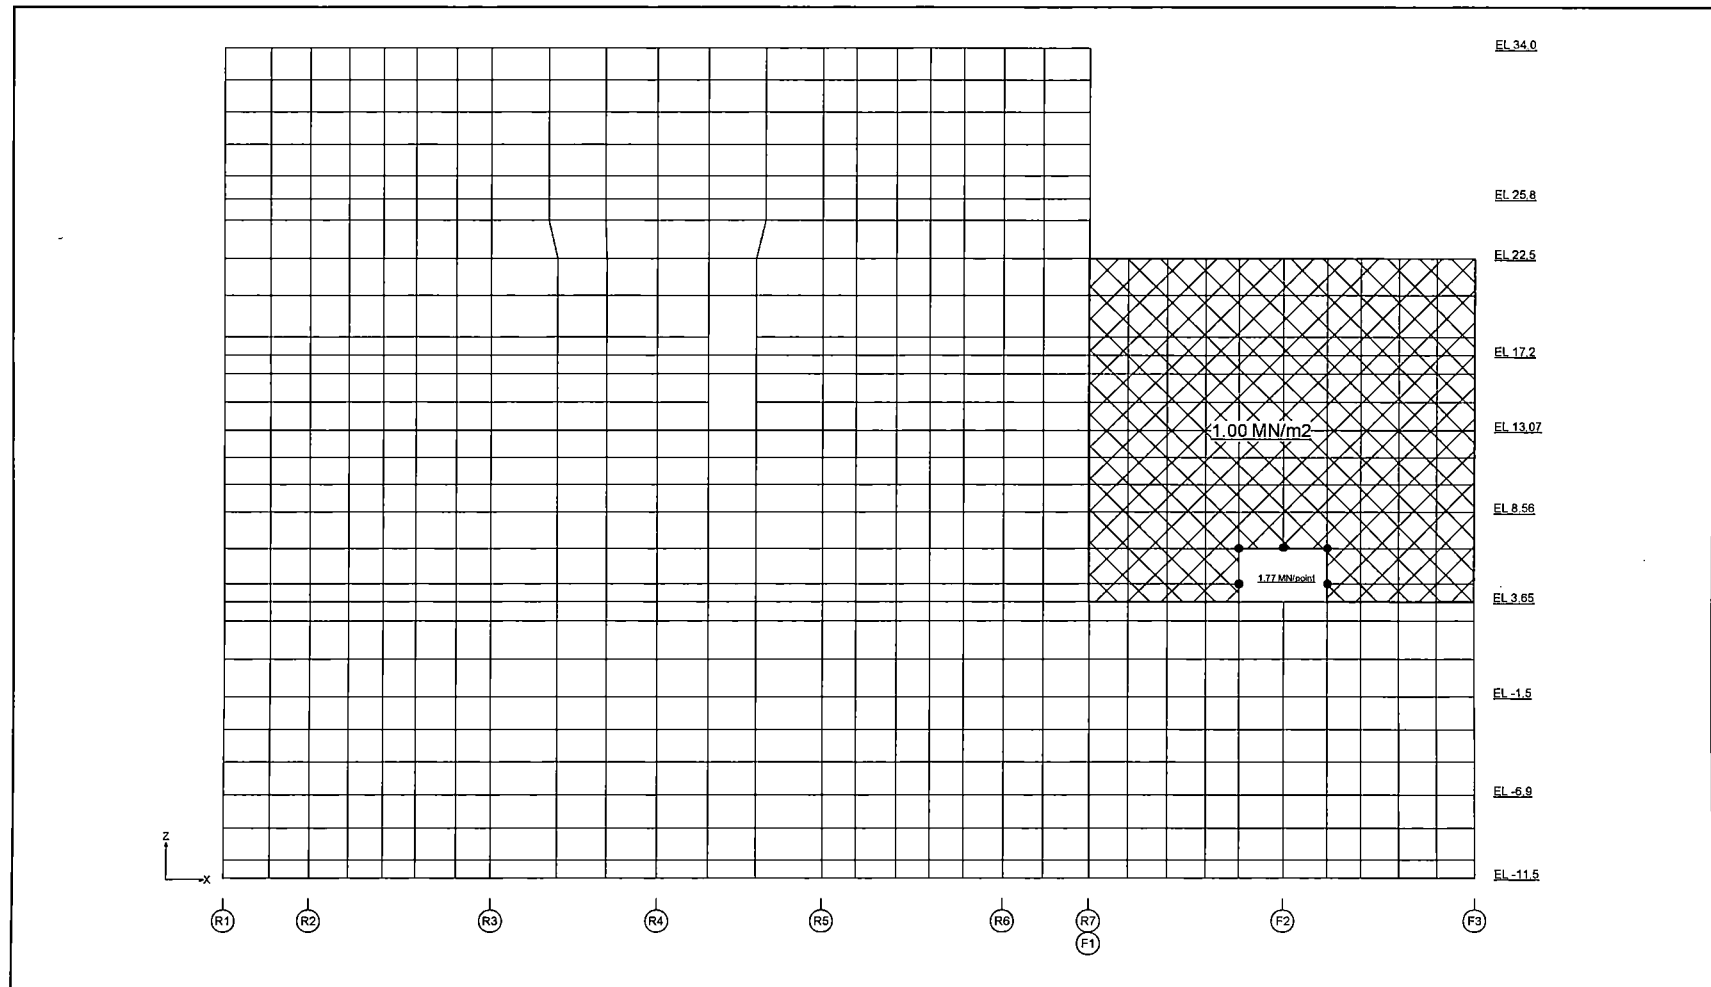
HEL B Pressure Load (for FB General Rooms: FF Wall)
